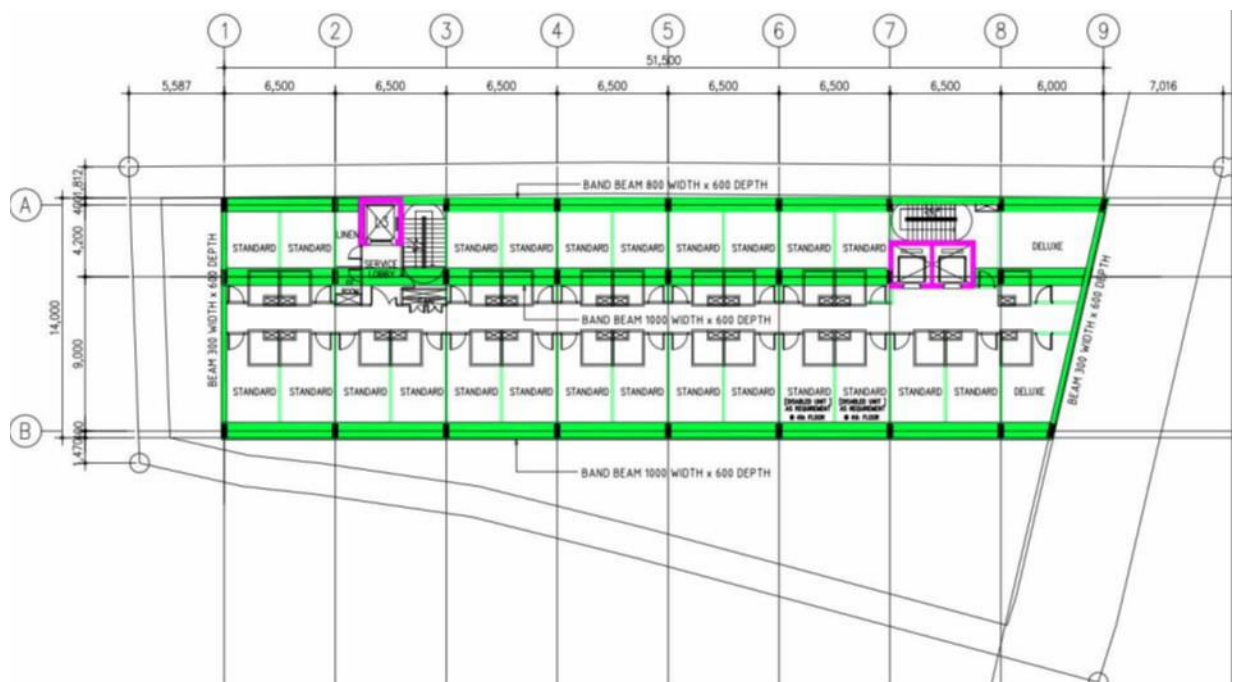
Structural Concept for Typical Floor of Option 3
